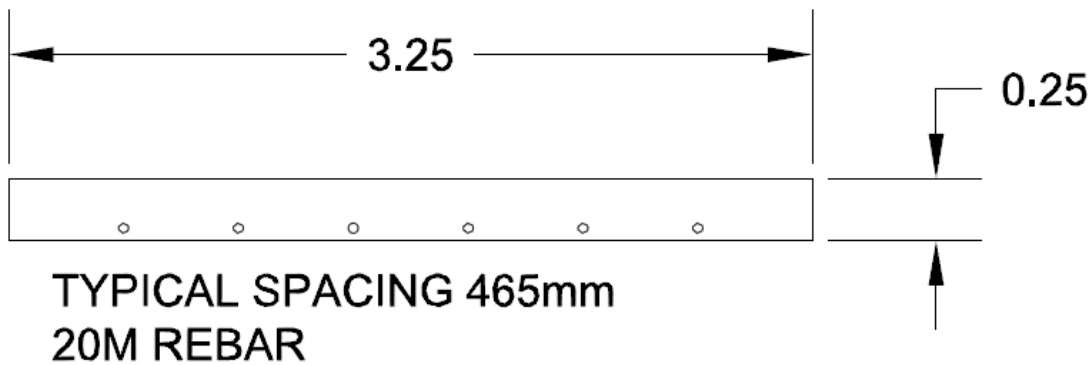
Typical Rebar Spacing for Vertical Concrete Walls
